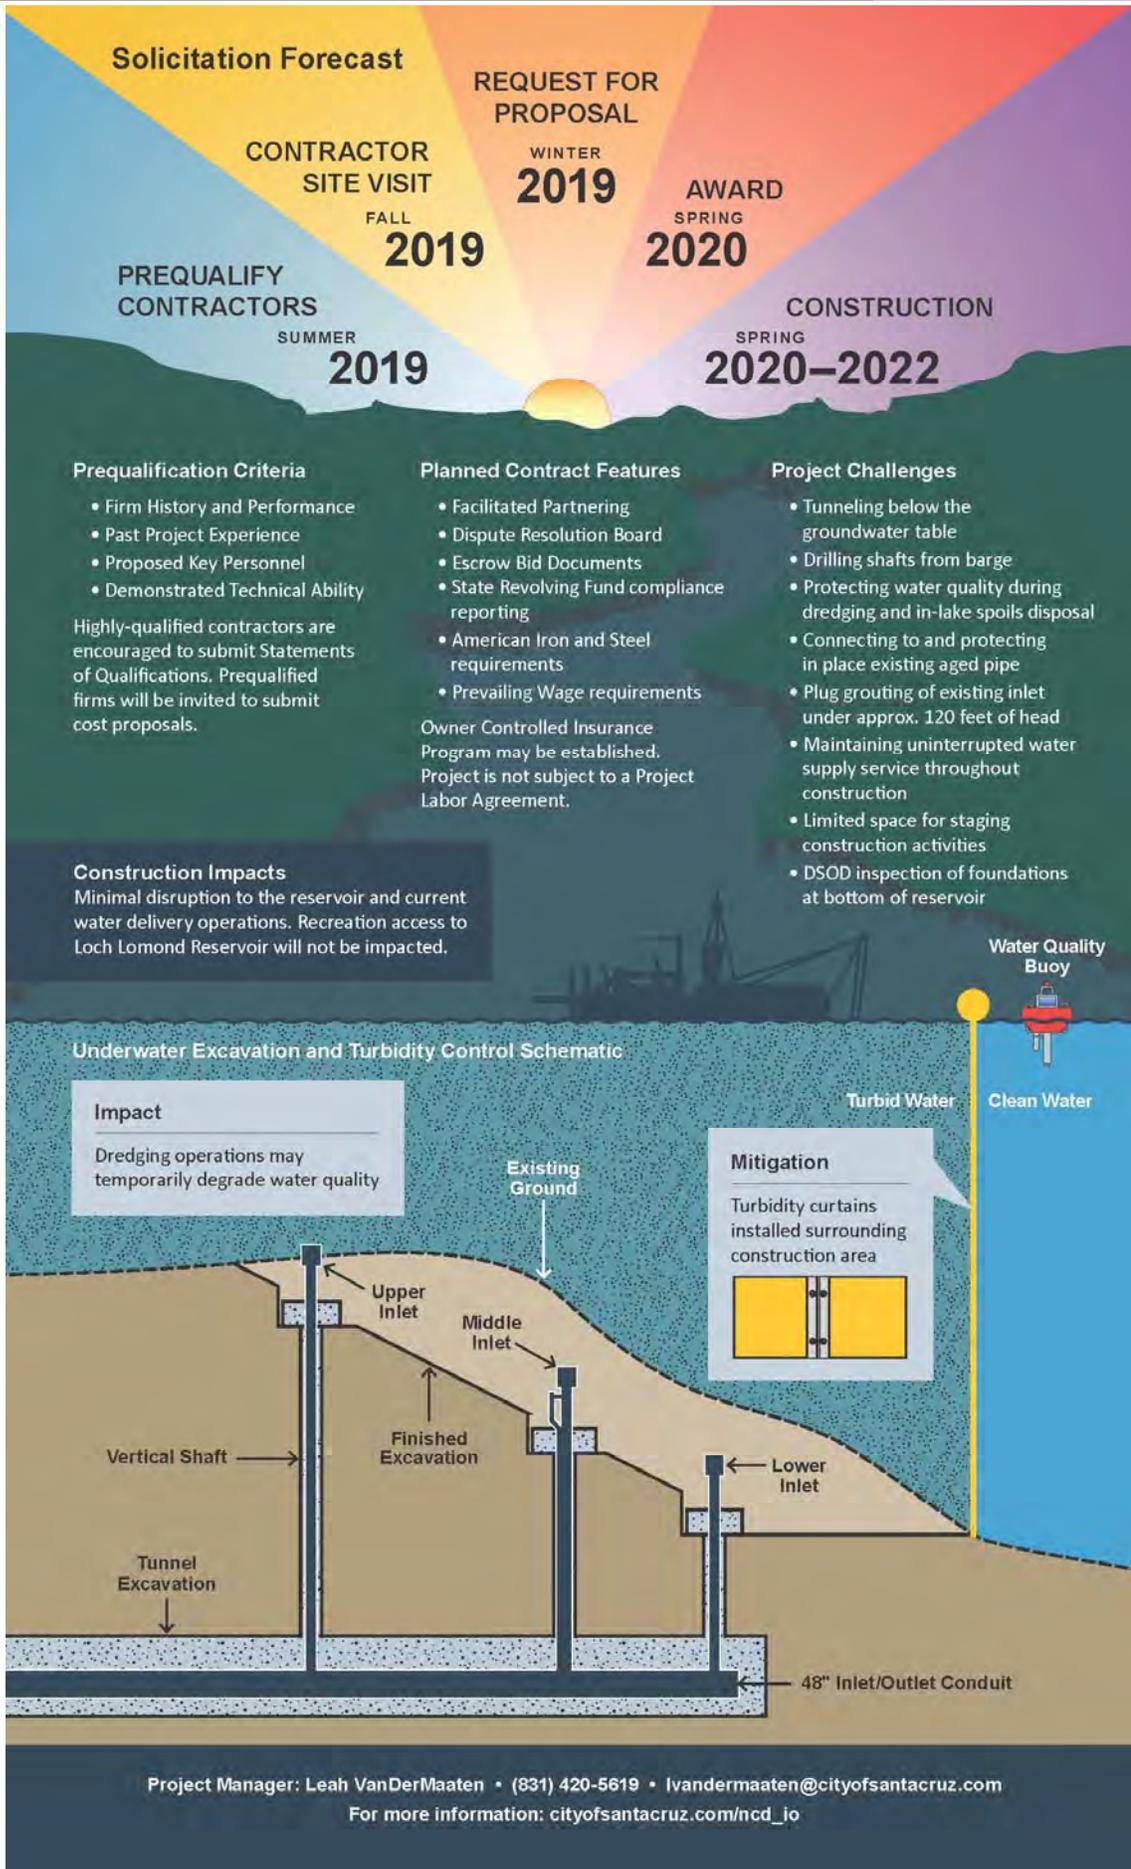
Newell Creek Dam Inlet/Outlet Project Summary Sheet for Contractor Outreach
